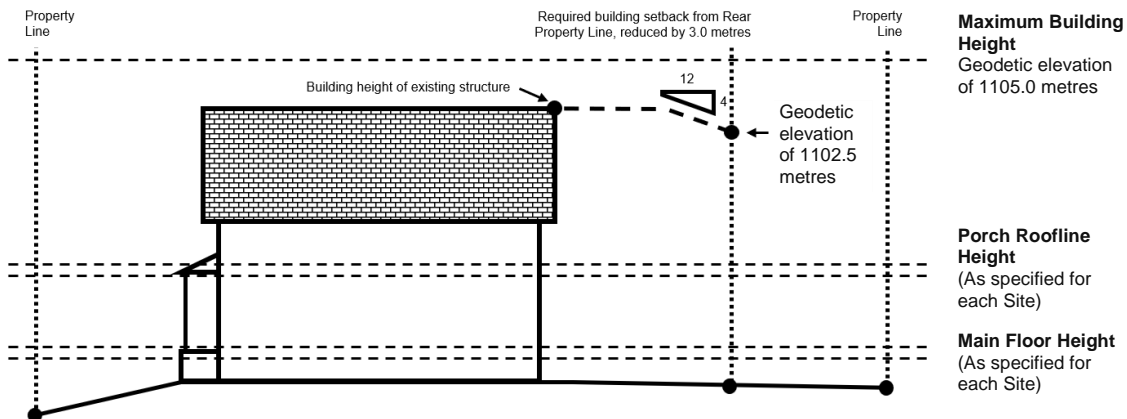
Side Elevation - Showing Maximum Height for Additions to Existing Buildings in Sites 1 and Site 2
